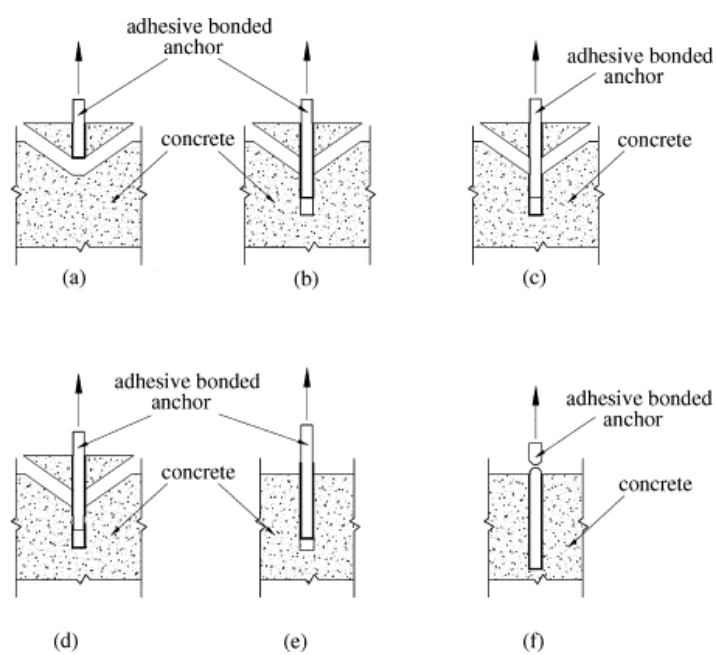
Failure modes of adhesive anchors in tension [3]: a) concrete cone failure; b) adhesive/concrete interface bond failure; c) steel/adhesive interface bond failure; d) mixed bond failure; e) bond failure; f) steel failure.
